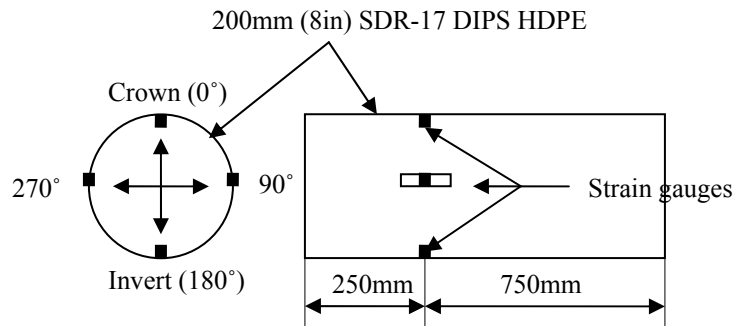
Arrangement of strain gauge inside the Pulling Head (PH) test section.
